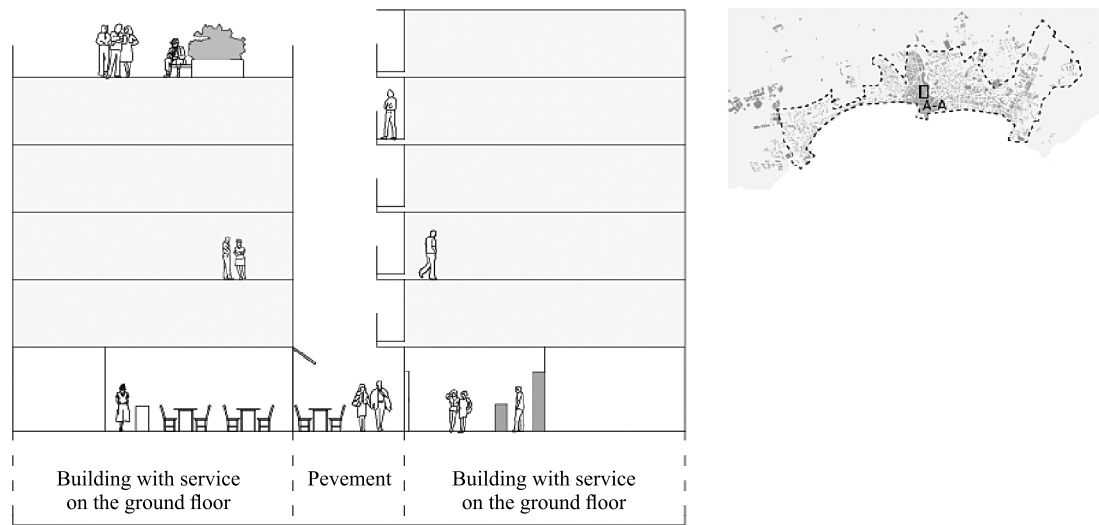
Section A-A. Sections of selected street in Benidorm, 3-6 storey buildings
